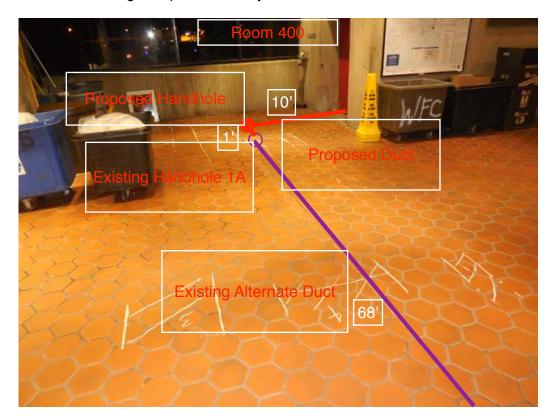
Existing / Proposed duct layout on mezzanine floor
